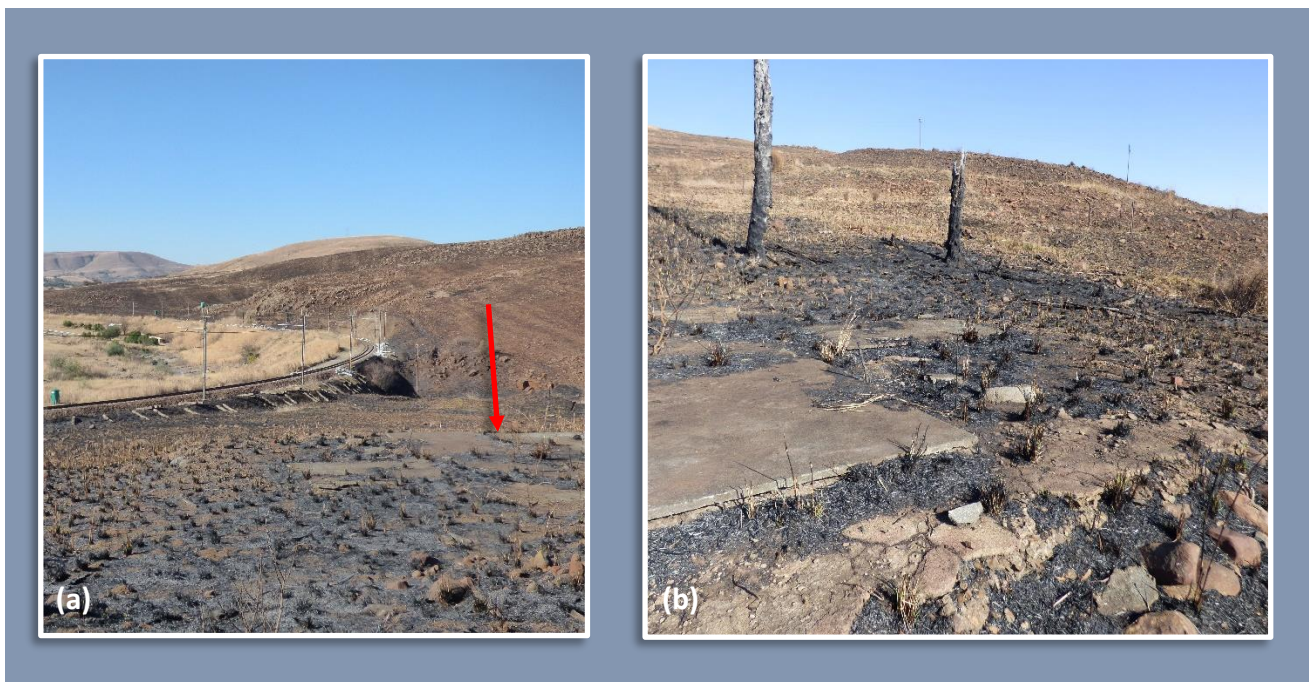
Site layout, KM 215.5 Pampoenspruit Bridge. Image: H. Fivaz.
